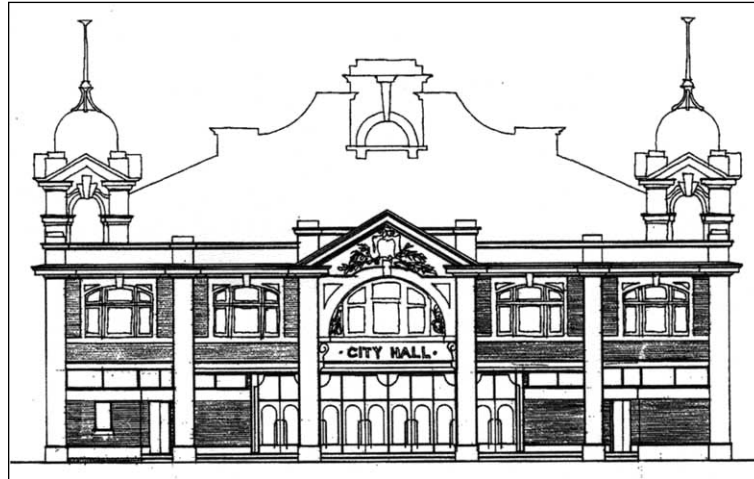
Macquarie Street elevation following 1974-5 refurbishment. cf 1914 elevation – figure 4 (HCC 7410-B2).
